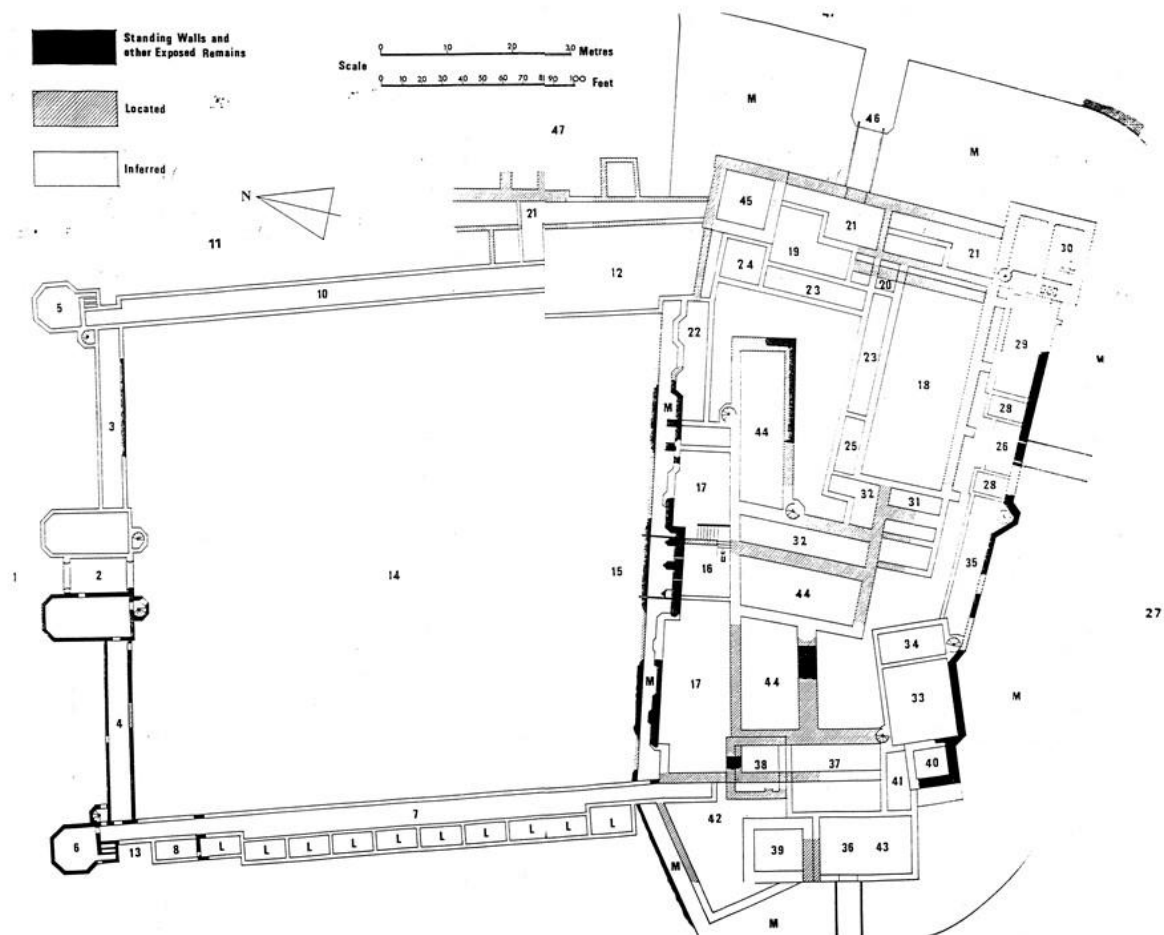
Plan of the Archbishop's Palace (Existing structures are in black)
